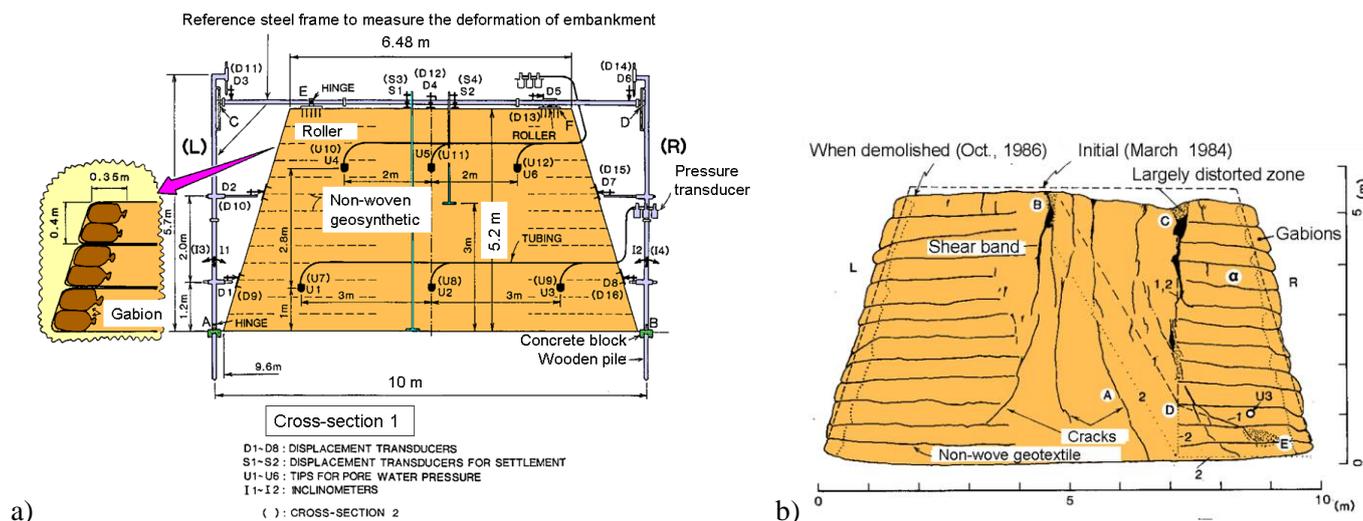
Cross-sections of Chiba No. 2 embankment: a) when completed; and b) one year after an artificial heavy rainfall test (Tatsuoka & Yamauchi, 1986; Tatsuoka et al., 1990, 2000, 2008).
